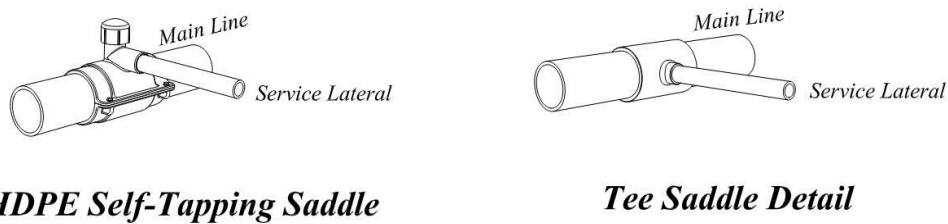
Typical Tapping Saddles for Service Connections to Sewer Mains
